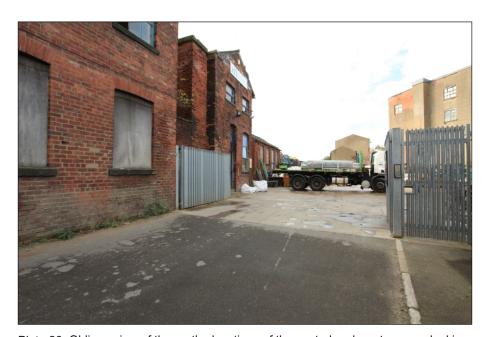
Oblique view of the north elevations of the central and west ranges, looking south-west (Film 2.08)
